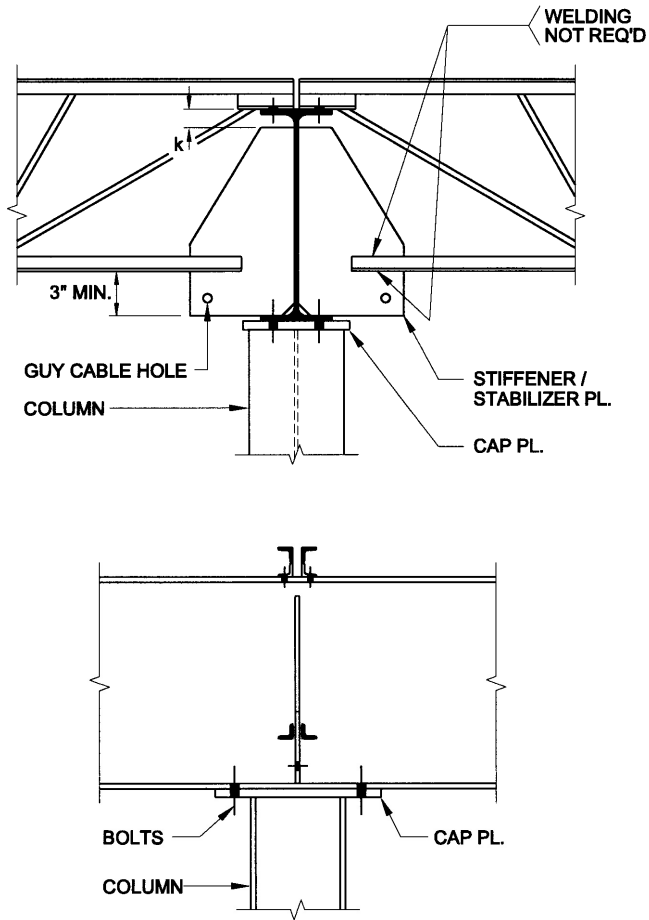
Beam framing continuously over column top, stability provided with stiffener plates, joist-chord extensions located above column top not welded.
